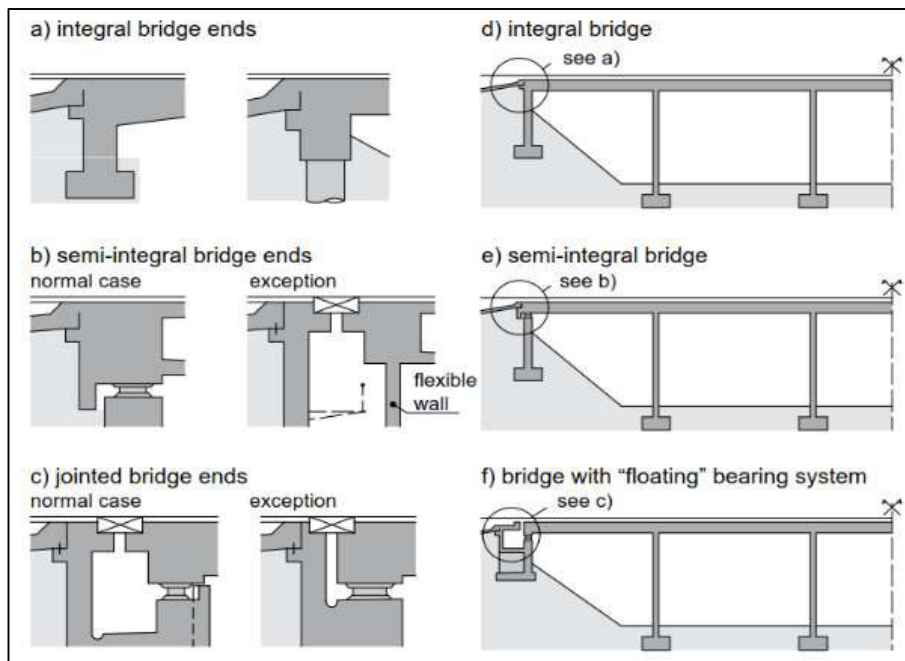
Various abutment forms used in integral bridge construction (PD 6694-1:2011)
